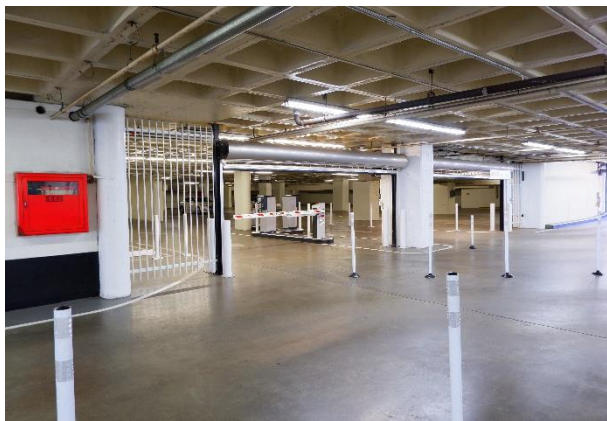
Underground parking garage with concrete waffle slab ceiling.
